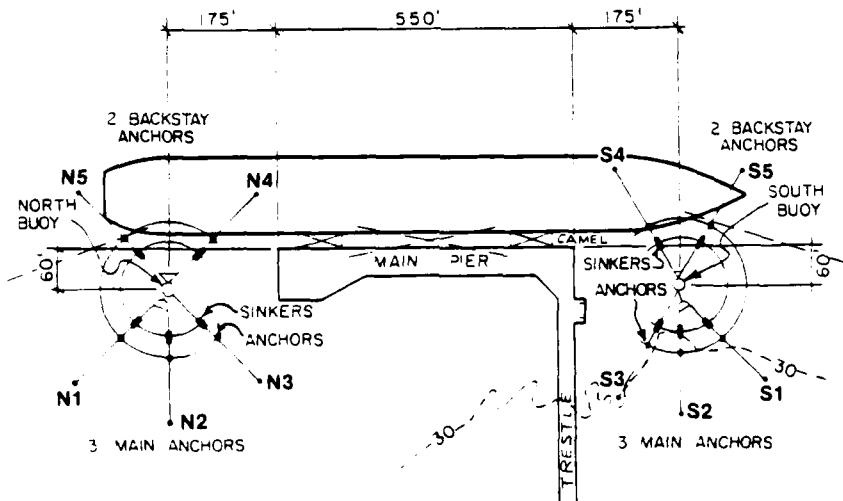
POL PIER MOORING SITE LAYOUT
